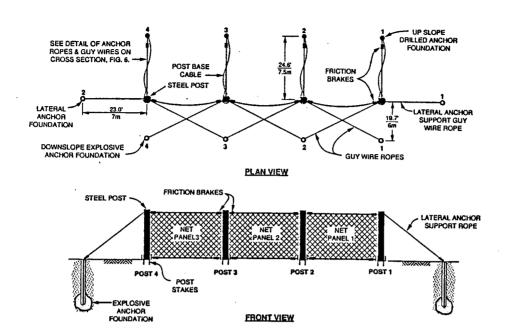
PLAN VIEW AND FRONT VIEW OF THE INDUSTRIAL ENTERPRISE ROCK NET CONSTRUCTED FOR THE INITIAL FIELD TESTING
